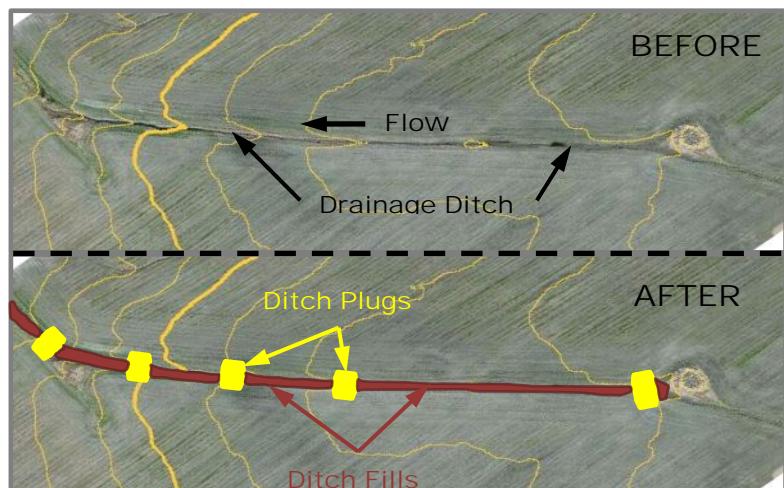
Ditch Plug/Fill Design for Sloped Wetland Setting – 2 Foot Contours
